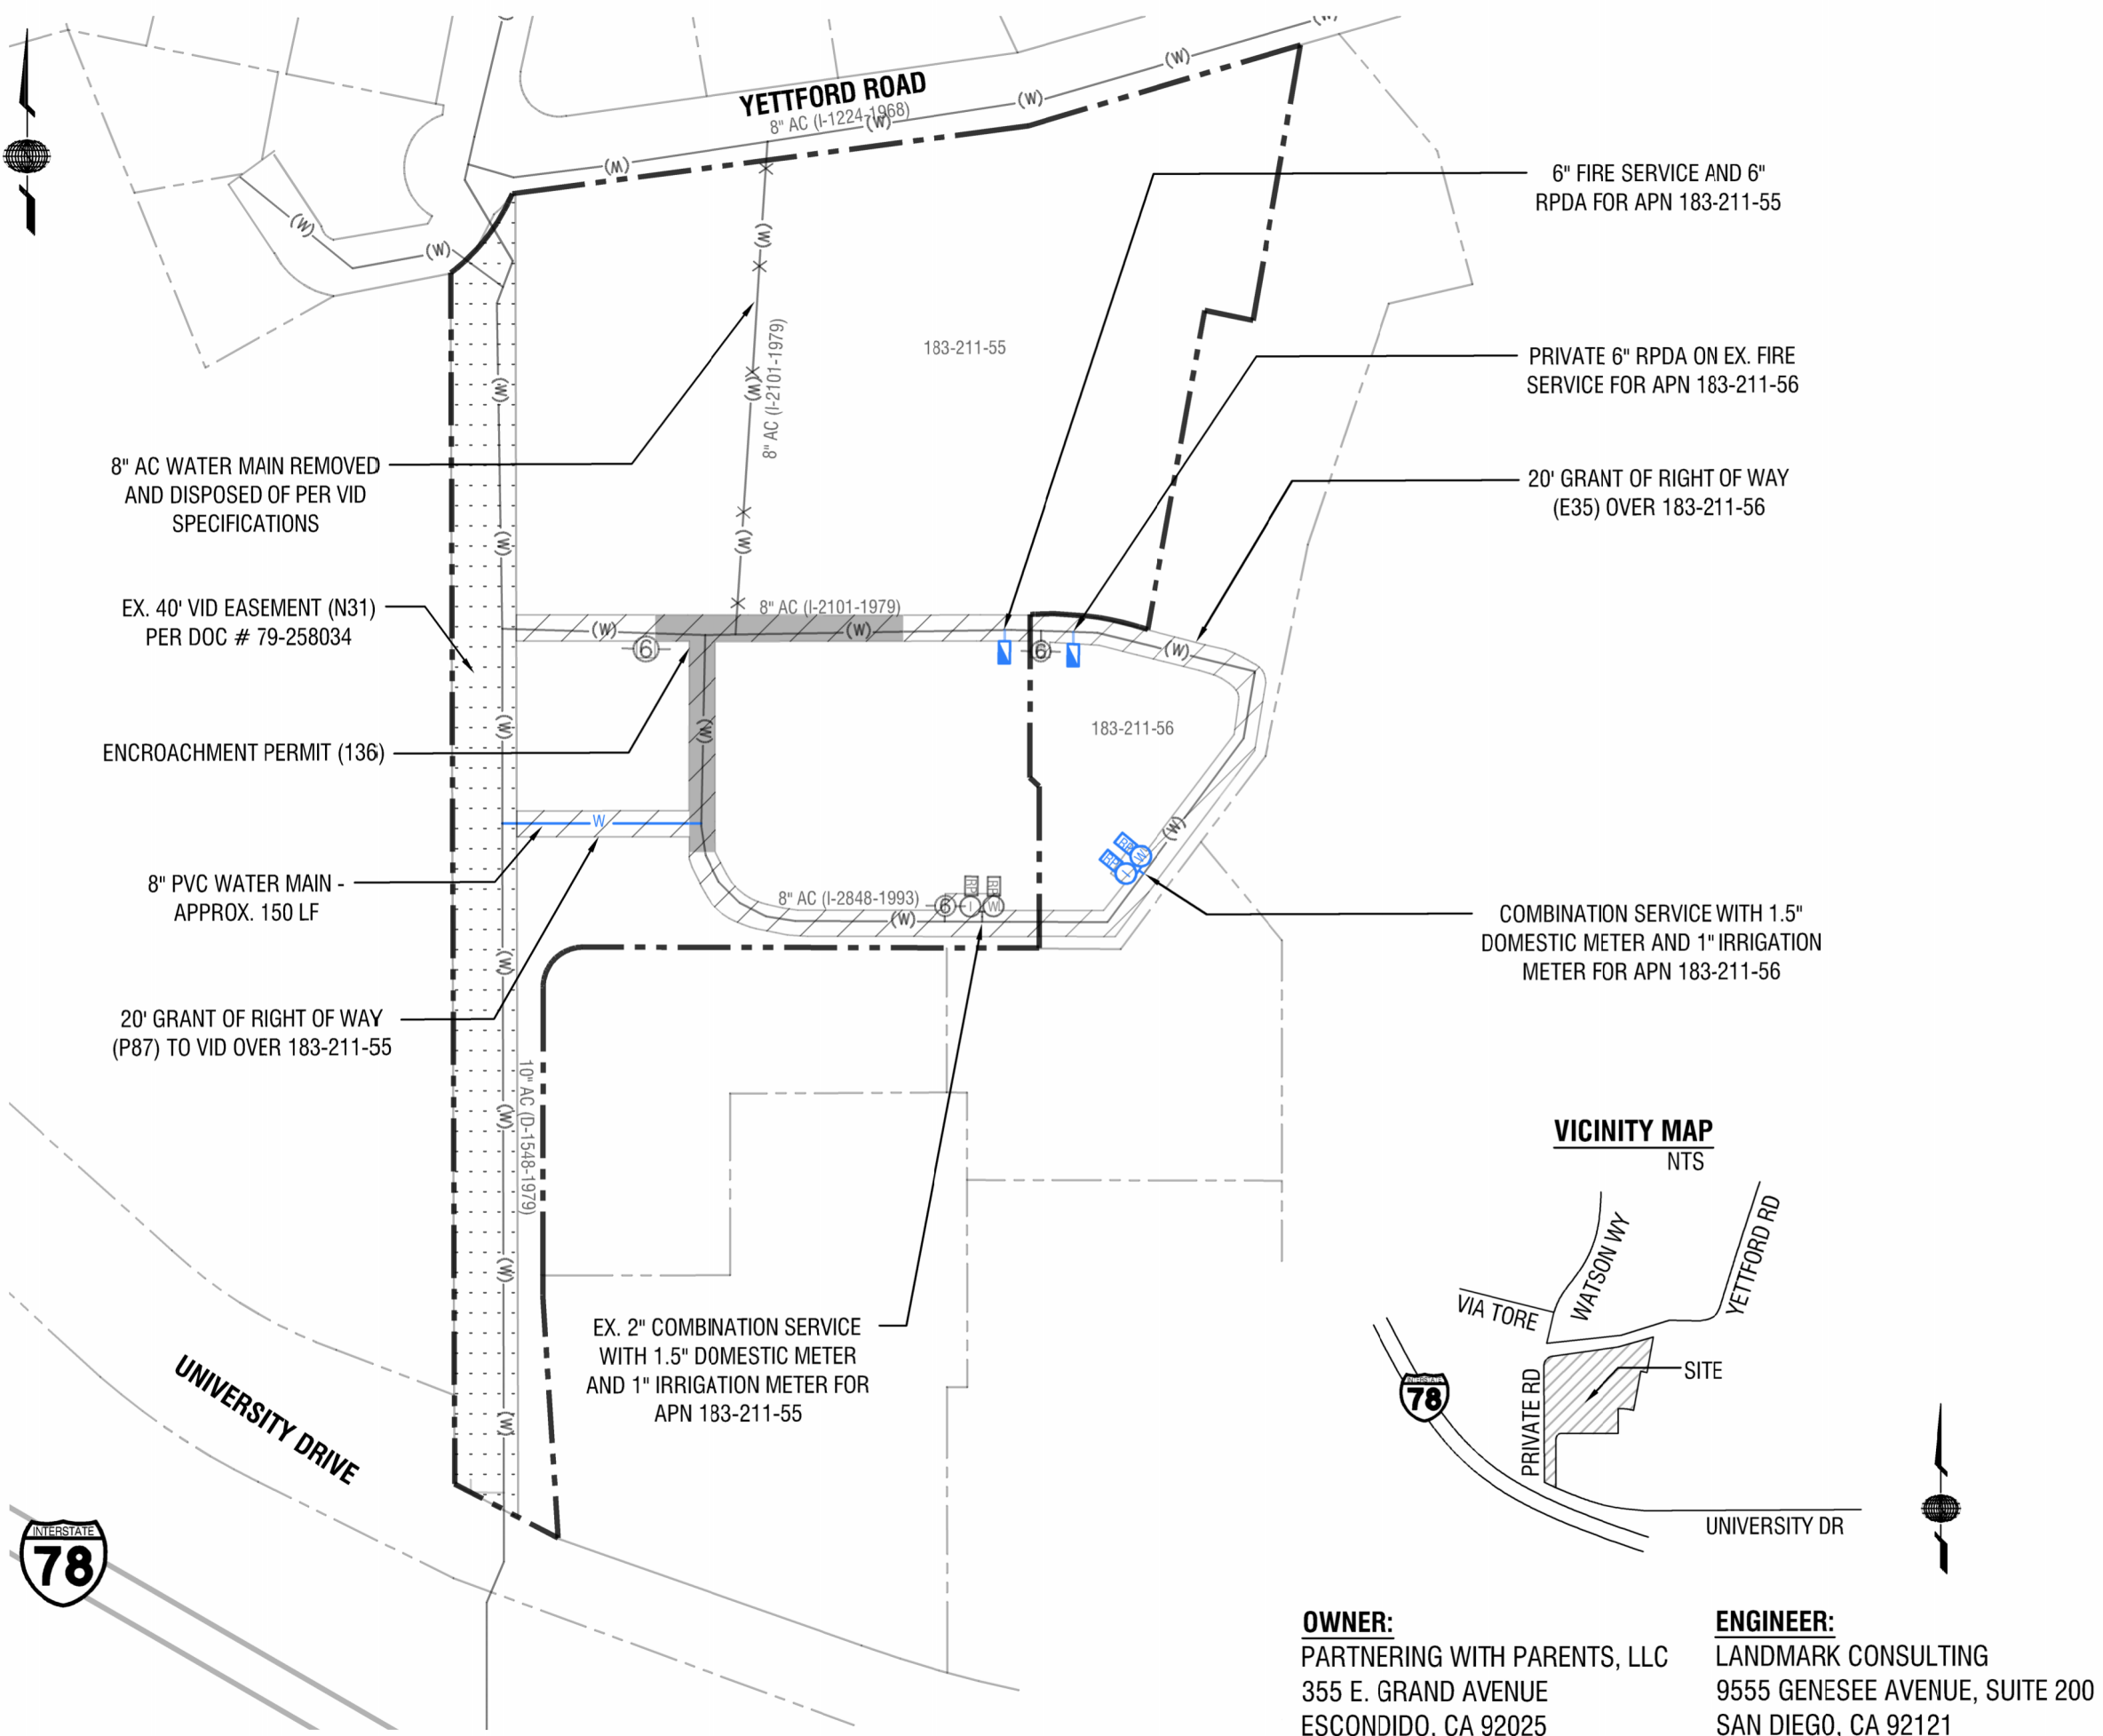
DETAILED REPORT: The existing Classical Academy Vista charter school (APN 183-211-55) demolished a northern parking lot area and constructed a new playground including play fields, equipment, restrooms, a storage building, and circular drop off area. The improvements required the relocation of onsite District waterline facilities and an encroachment permit for new concrete pavers and utility crossings. Additionally, new services were required for the site and the adjacent parcel (Dual Language Immersion North County charter school, APN 183-211-56).
